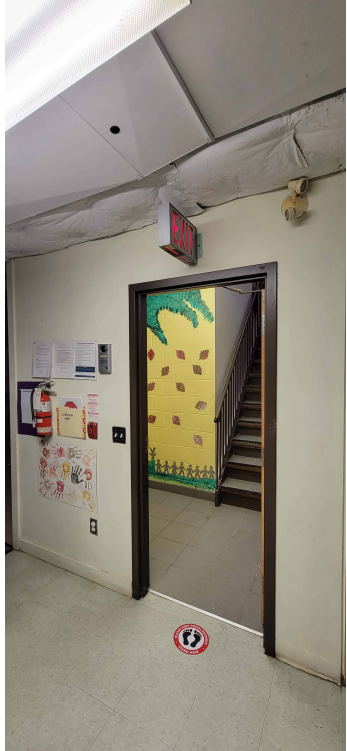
STAIR A TEMPORARY WAITING AREA
